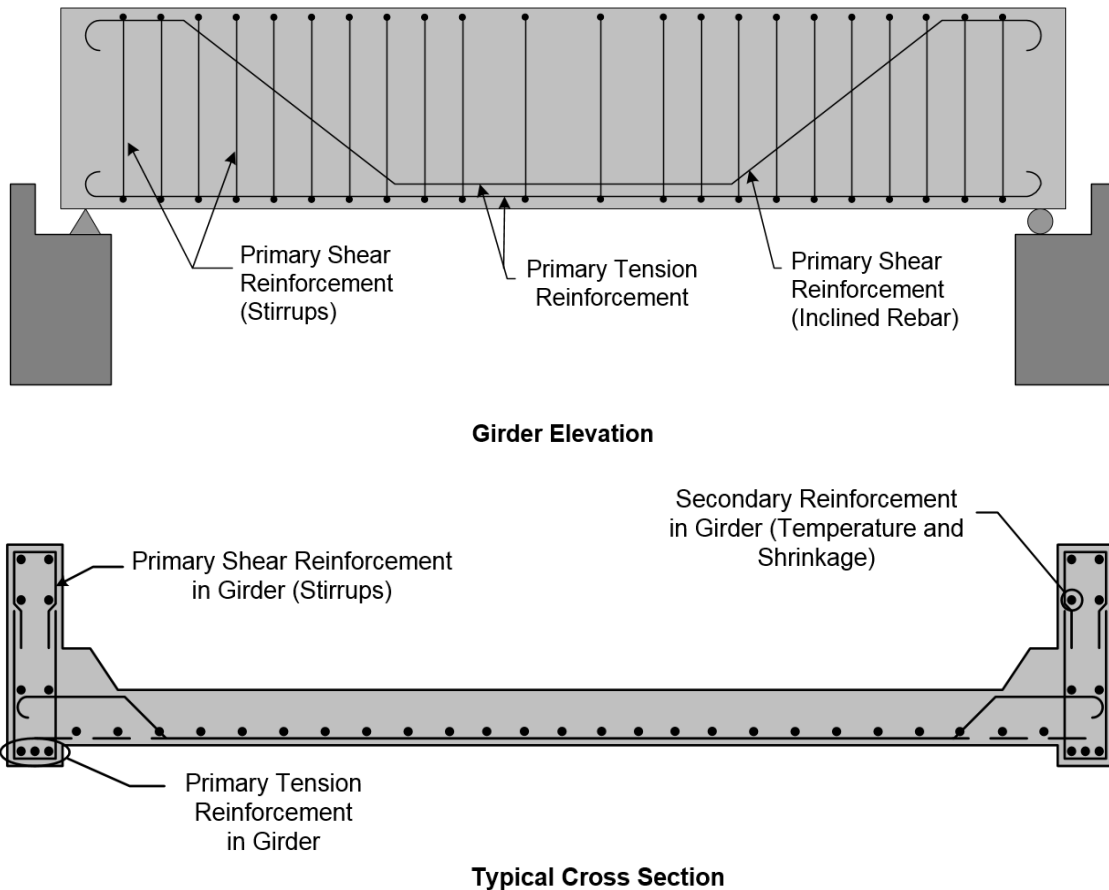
Steel Reinforcement in a Simple Span Concrete Through Girder
